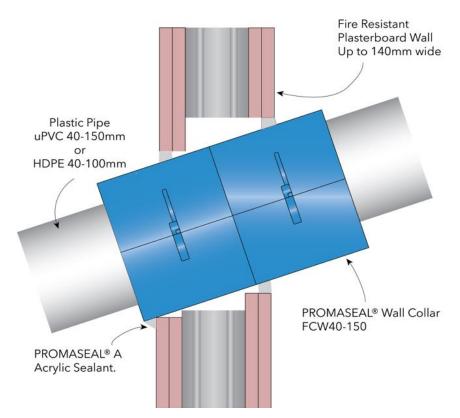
Proposed construction of angled FCW collars in plasterboard walls
